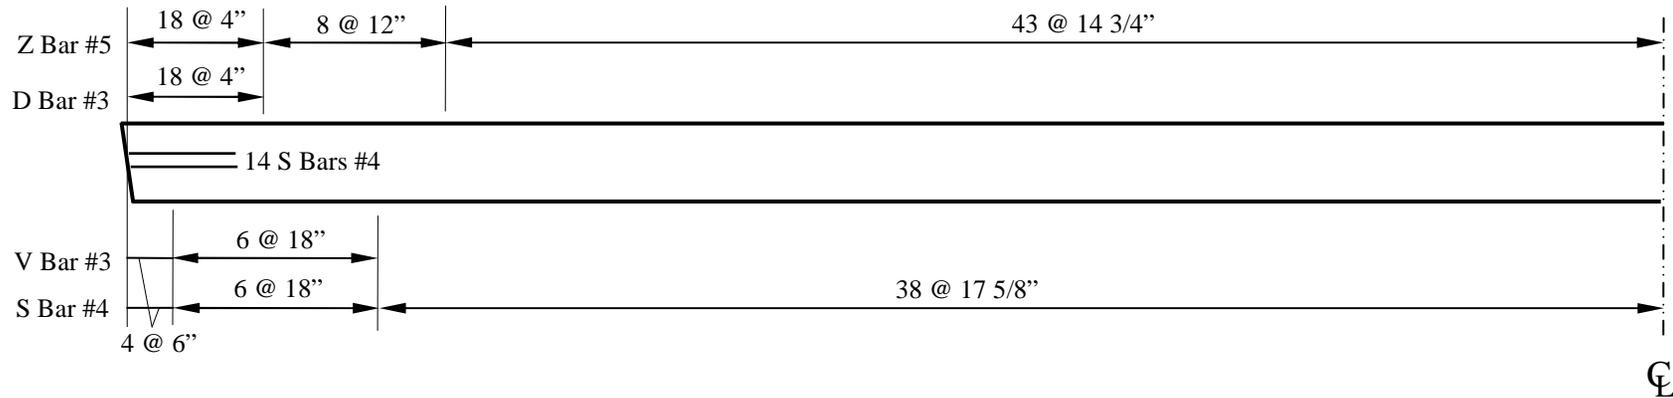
Mild Steel Spacing in BT-72 Girders
